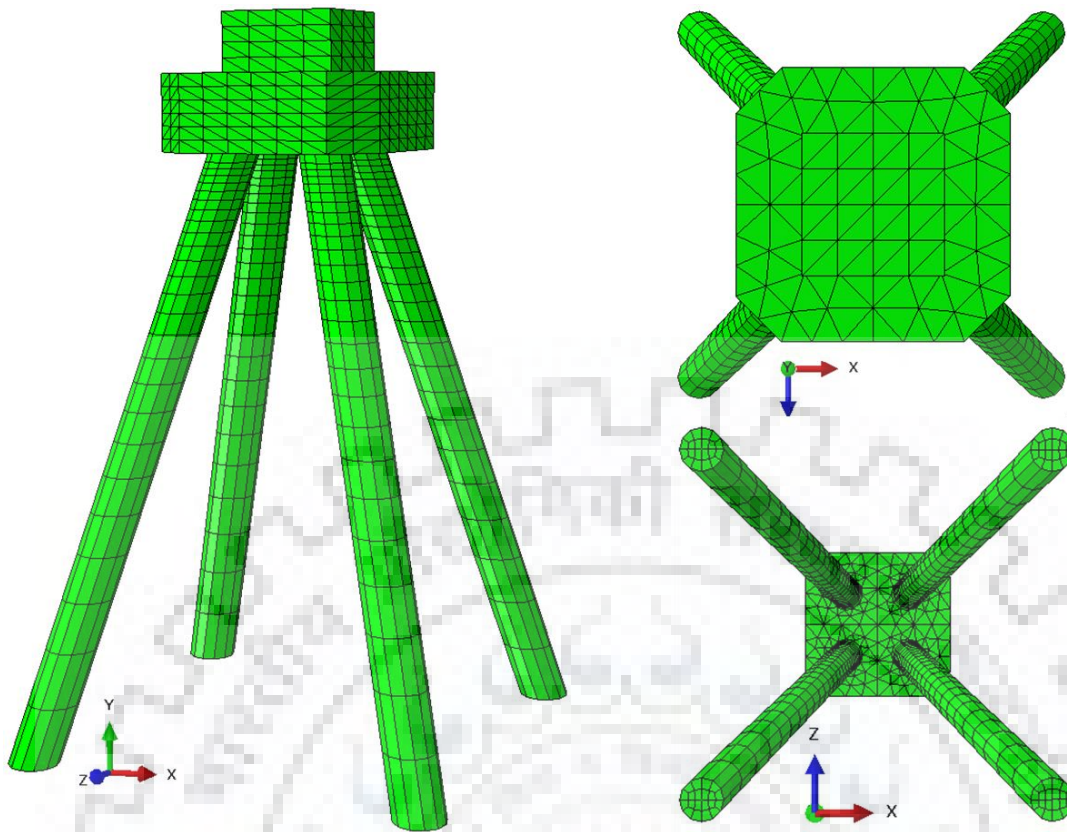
Pile group with cap and machine assembly for 4BG
